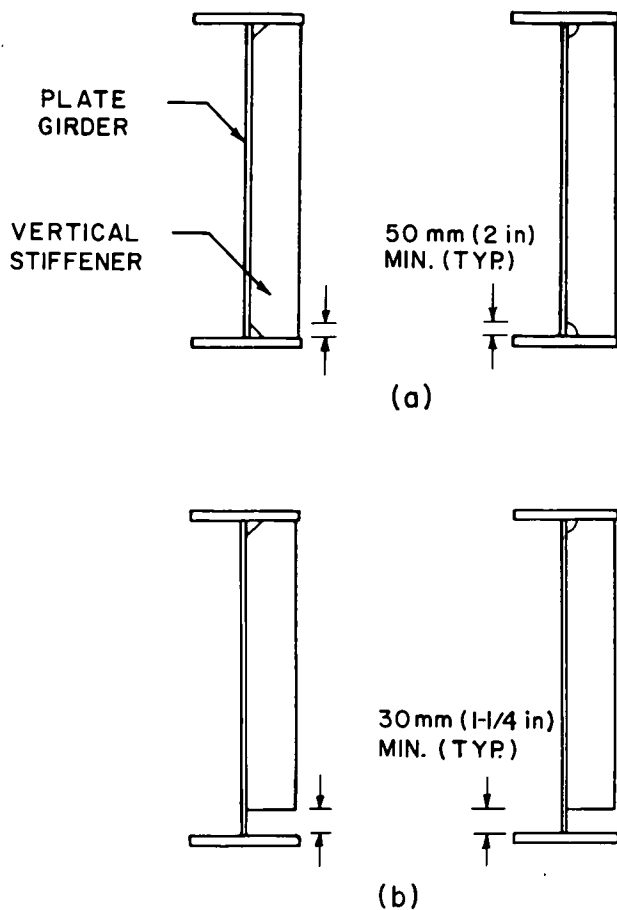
Stiffener details: (a) bearing or intermediate stiffeners fitted or welded to bottom flange; (b) intermediate stiffeners not fitted or welded to bottom flange.
